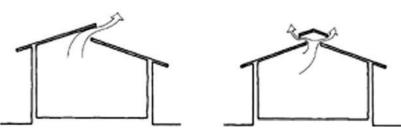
Two resources to force air movement through the opening in the ceilings.
